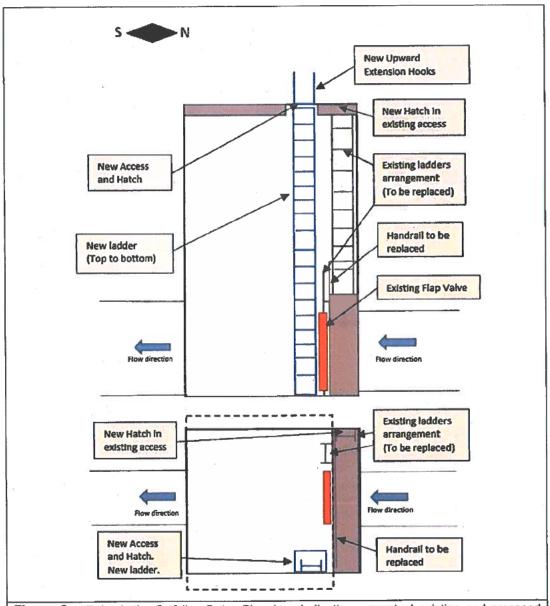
Bulverhythe Outfall — Outer Chamber. Indicative conceptual existing and proposed arrangement sketch (cross section and plan view).
